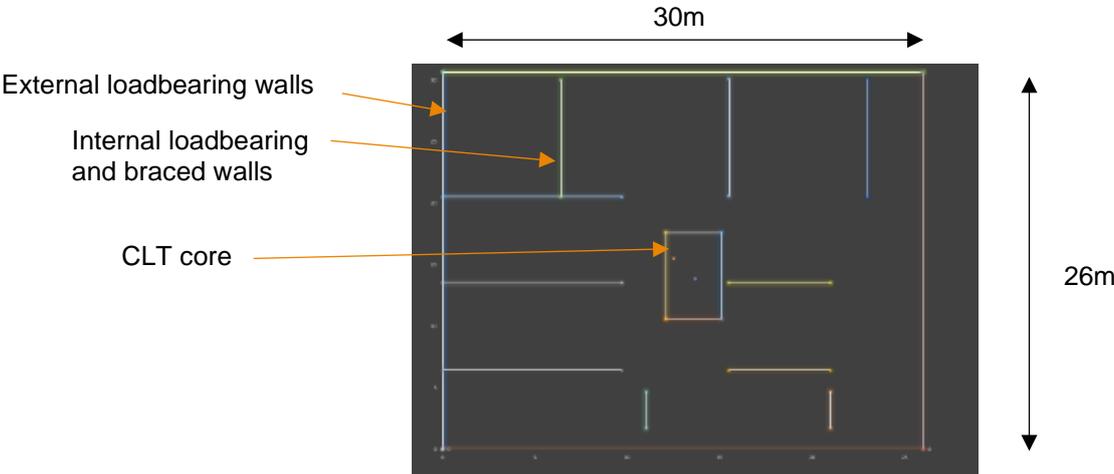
Analysis apartment plan of load bearing and bracing walls
